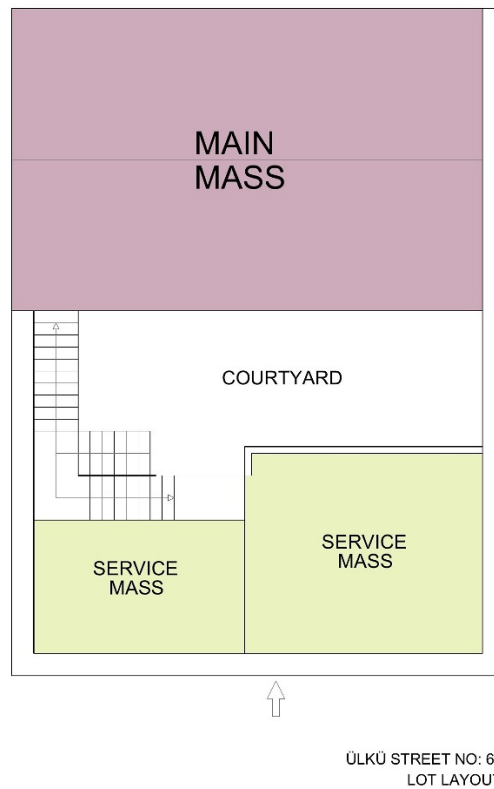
The lot layout of Ülkü-63 house (Author, 2023)
